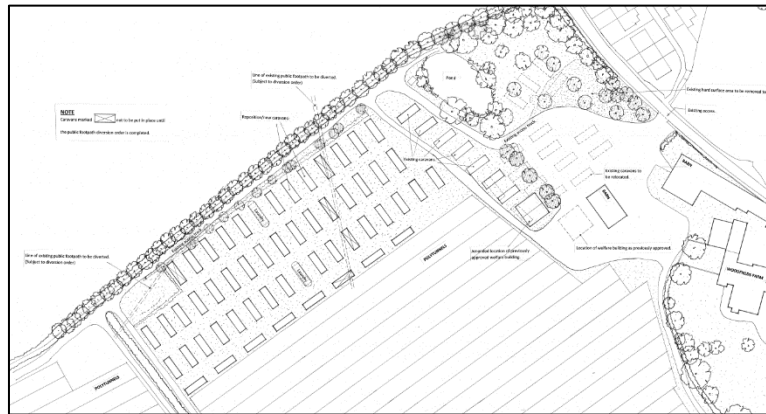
Proposed site plan with footpath notes added and siting of caravans
